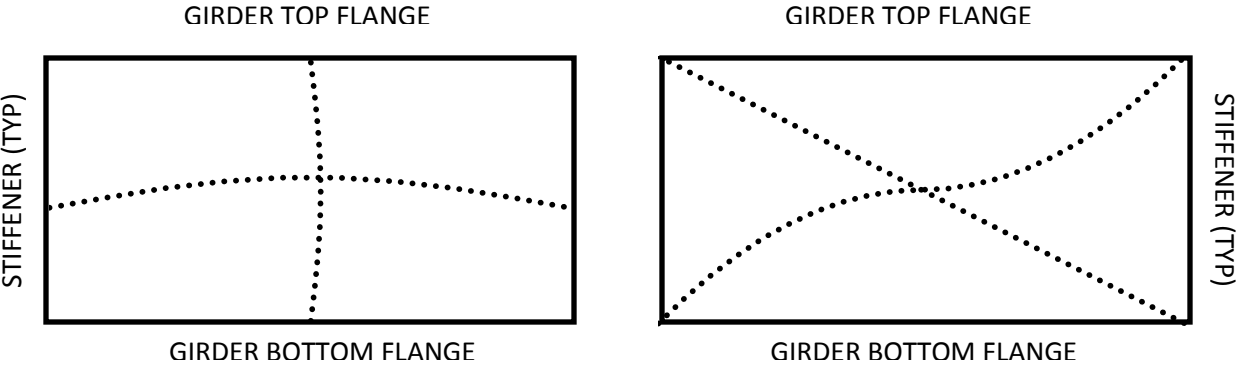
Imperfect Shape in Web to Trigger Local Buckling in a Plate Girder
